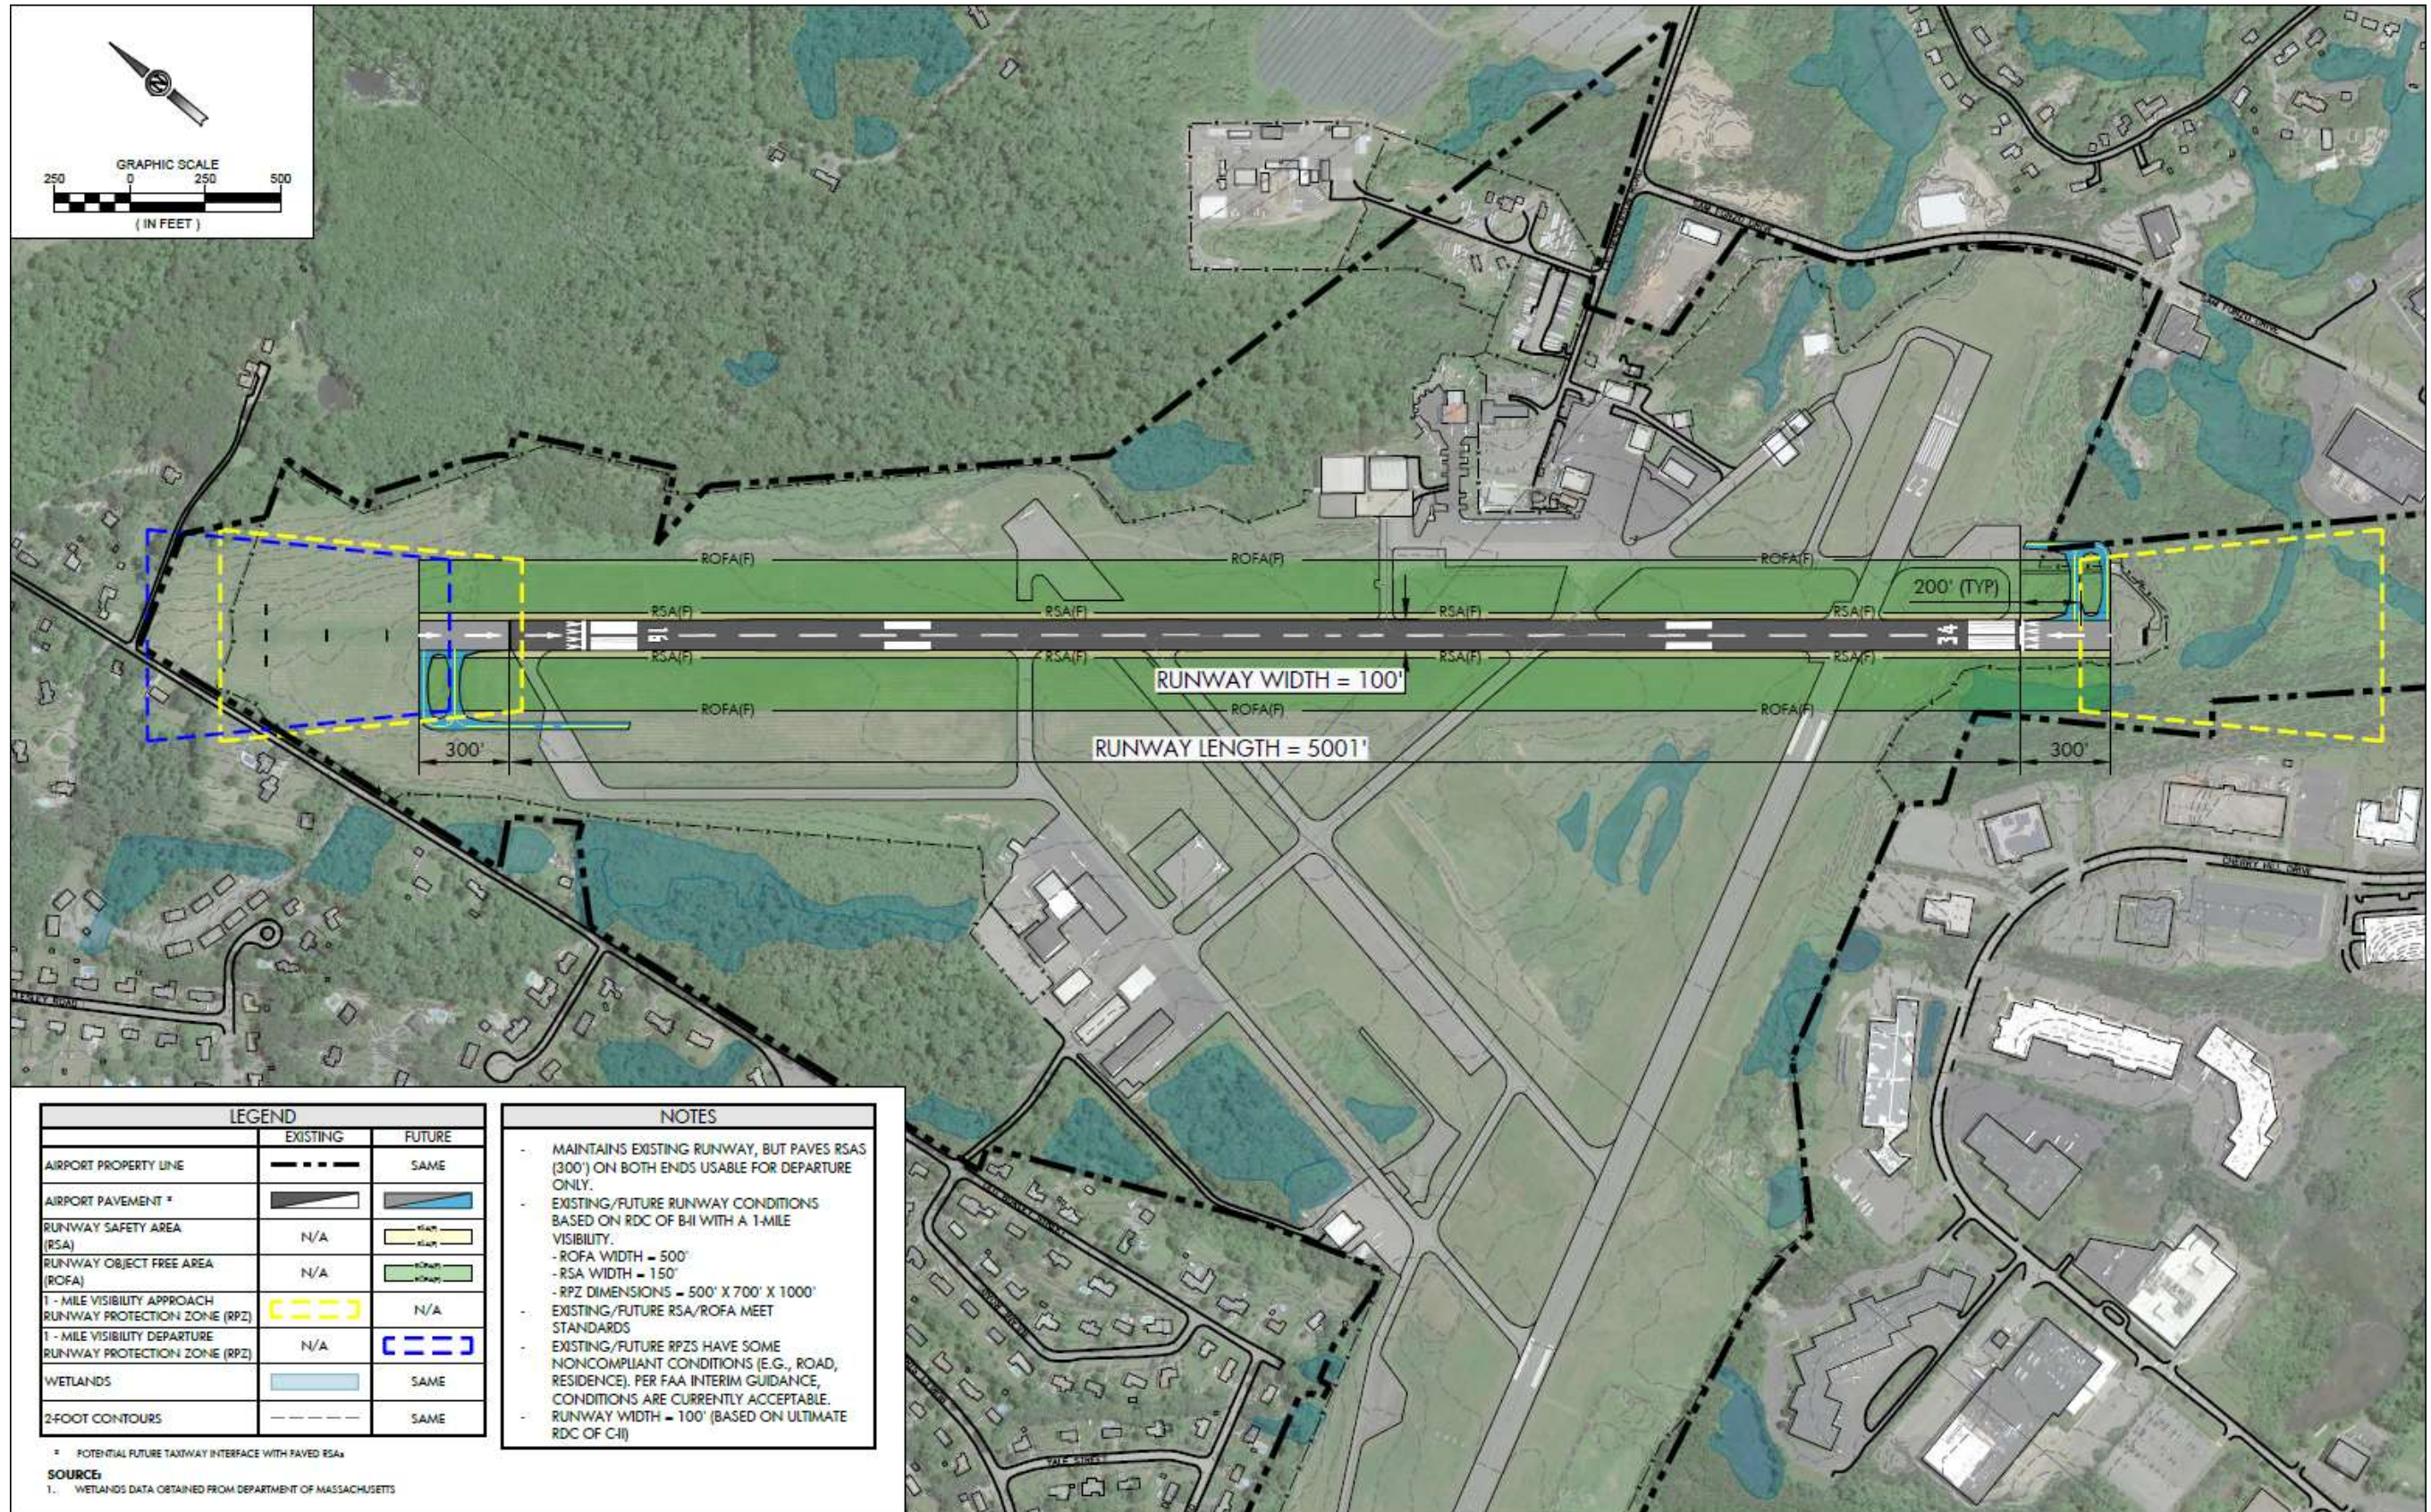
Runway 16-34 Alternative 1: Maintain Existing
